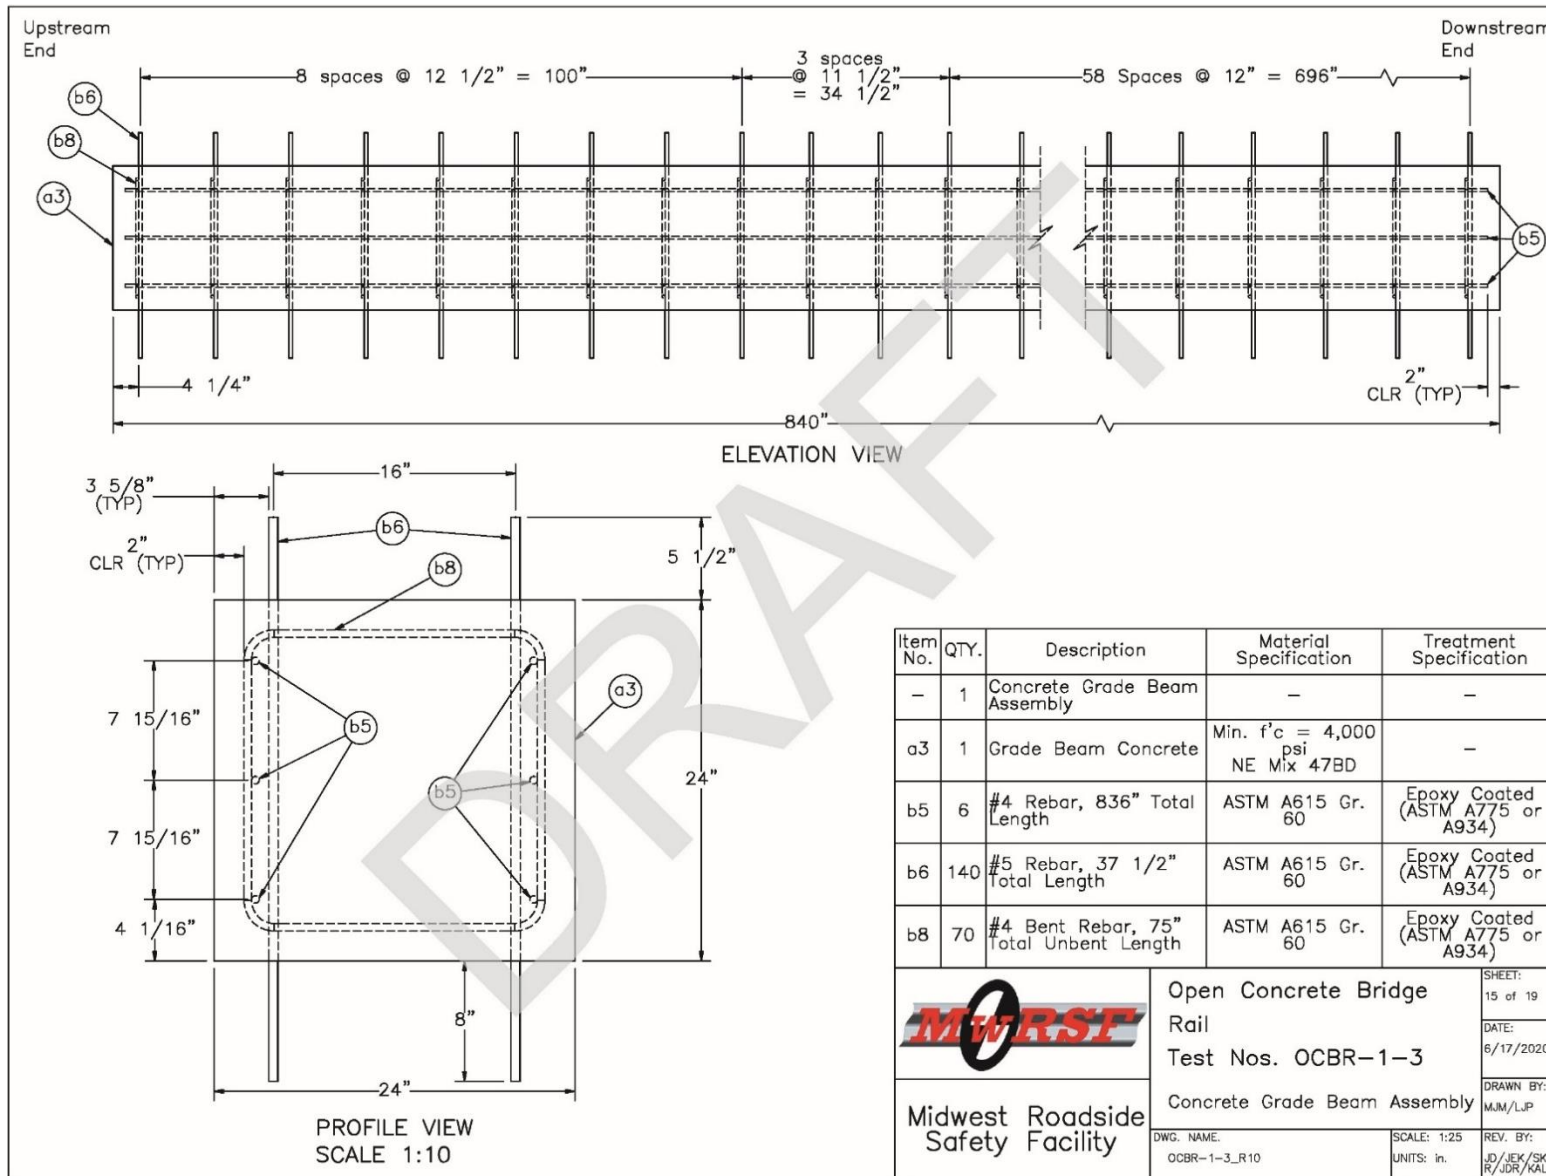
Open Concrete Bridge Rail Grade Beam Detail
